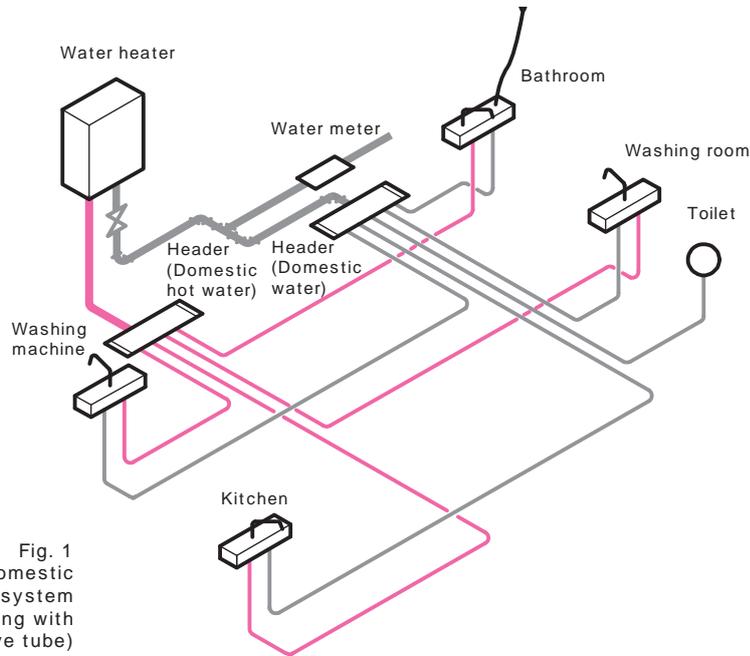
Overview of central domestic hot water system (header-conduit piping with sleeve tube)
